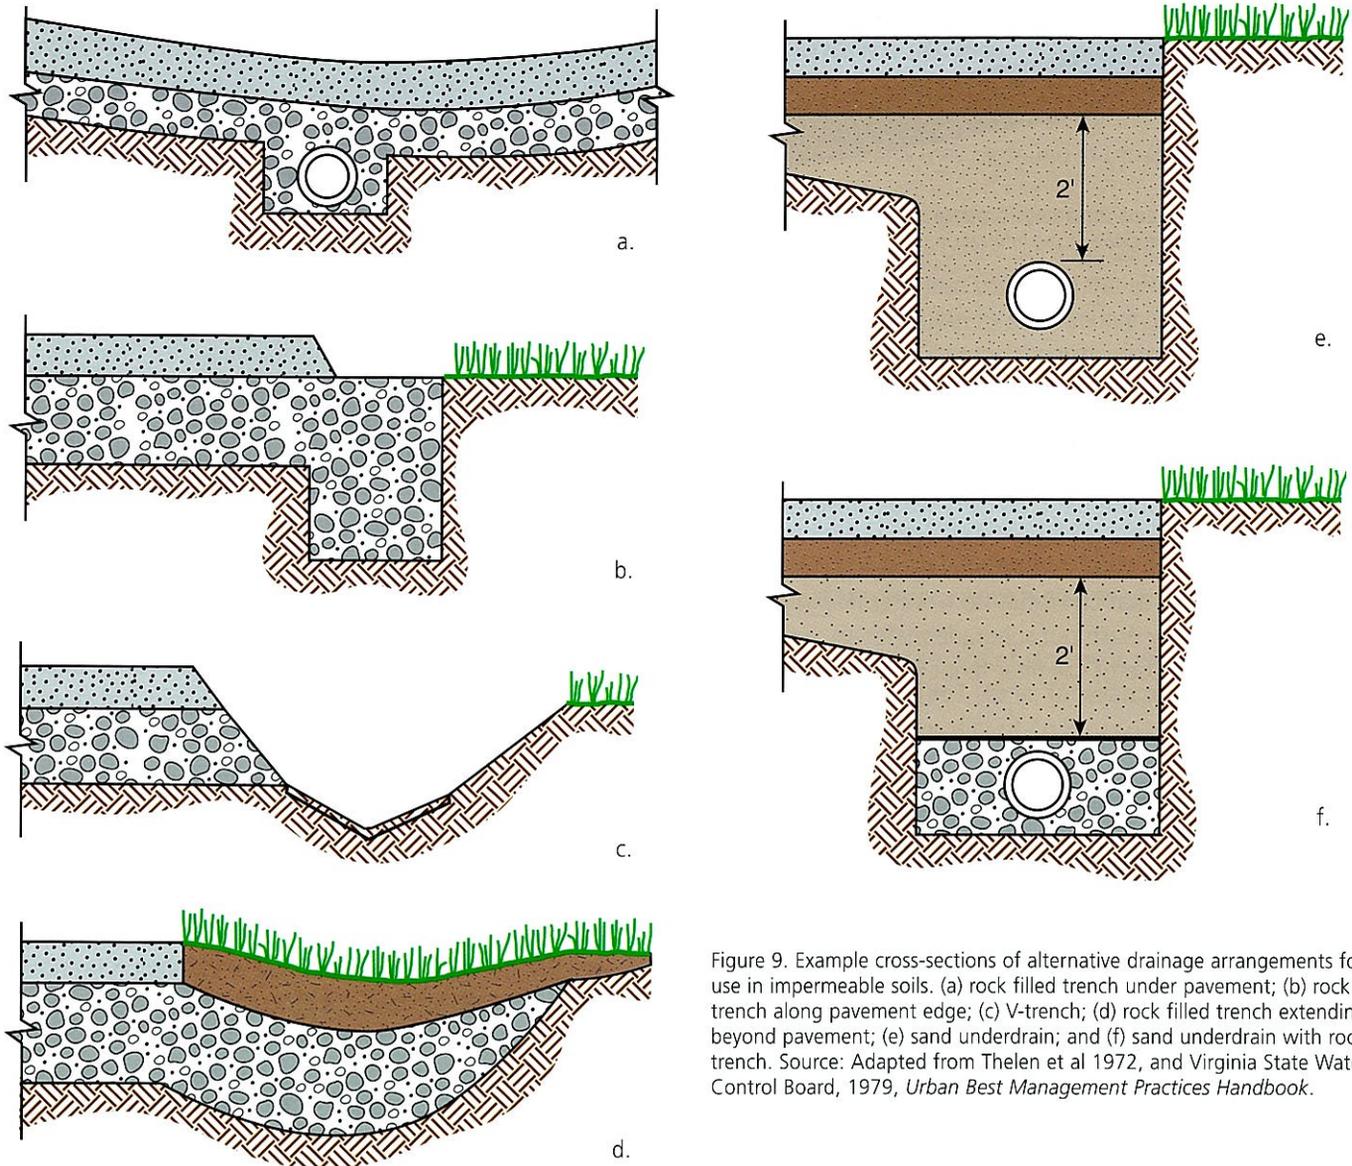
Example cross-sections of alternative drainage arrangements for use in impermeable soils. (a) rock filled trench under pavement; (b) rock trench along pavement edge; (c) V-trench; (d) rock filled trench extending beyond pavement; (e) sand underdrain; and (f) sand underdrain with rock trench. Source: Adapted from Thelen et al 1972, and Virginia State Water Control Board, 1979, *Urban Best Management Practices Handbook*.
